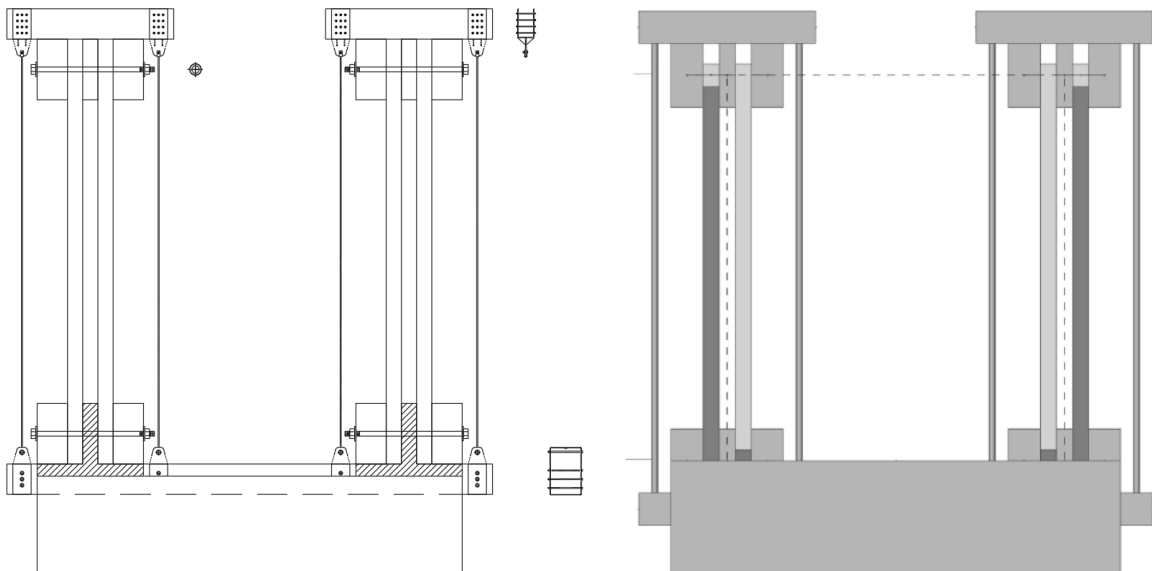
a) Cross-Section of the Deck and Arrangement of the Truss Beams; b) Cross-Section from the 3D Model – SCIA Engineering
